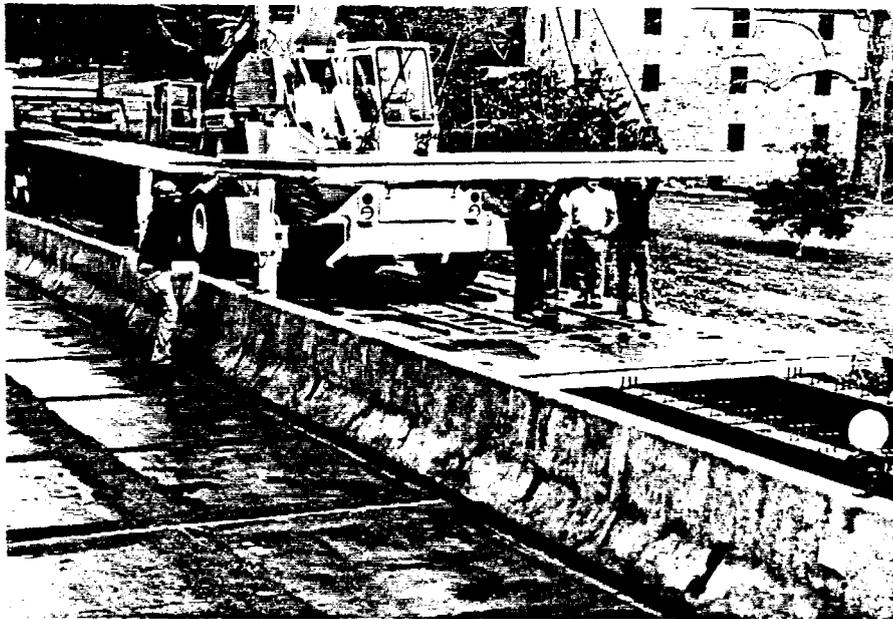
Precast concrete deck panel is lowered onto steel stringers, which are covered with epoxy mortar (19, 71).
